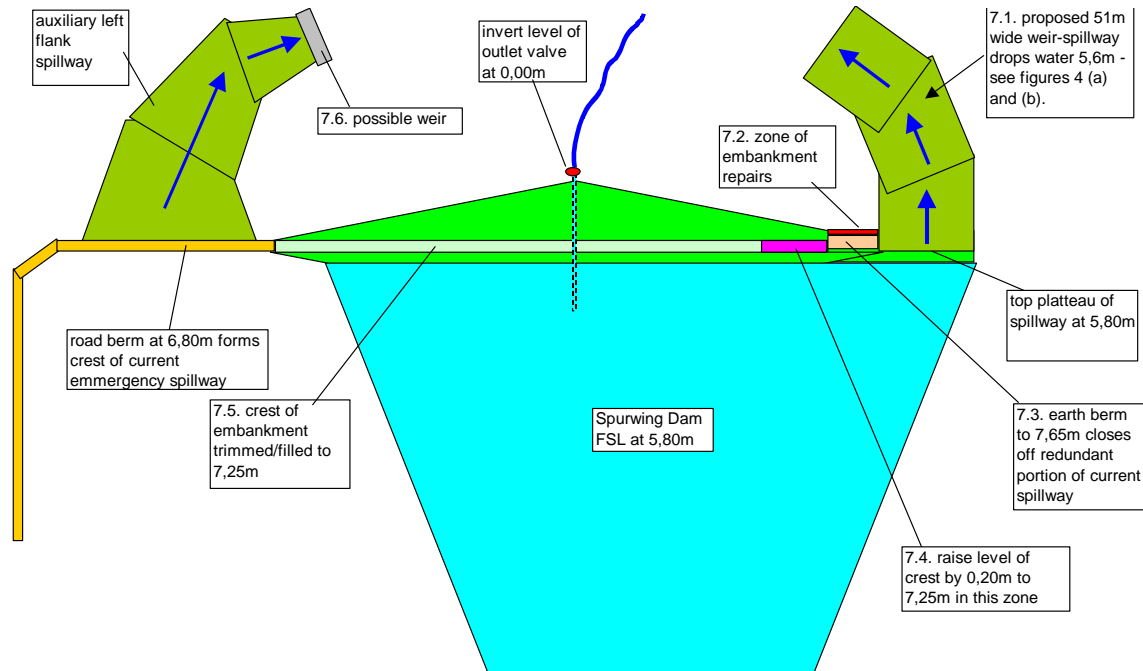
Schematic Plan of Spurwing Dam indicating proposed scheme of work (7.1 to 7.6).
